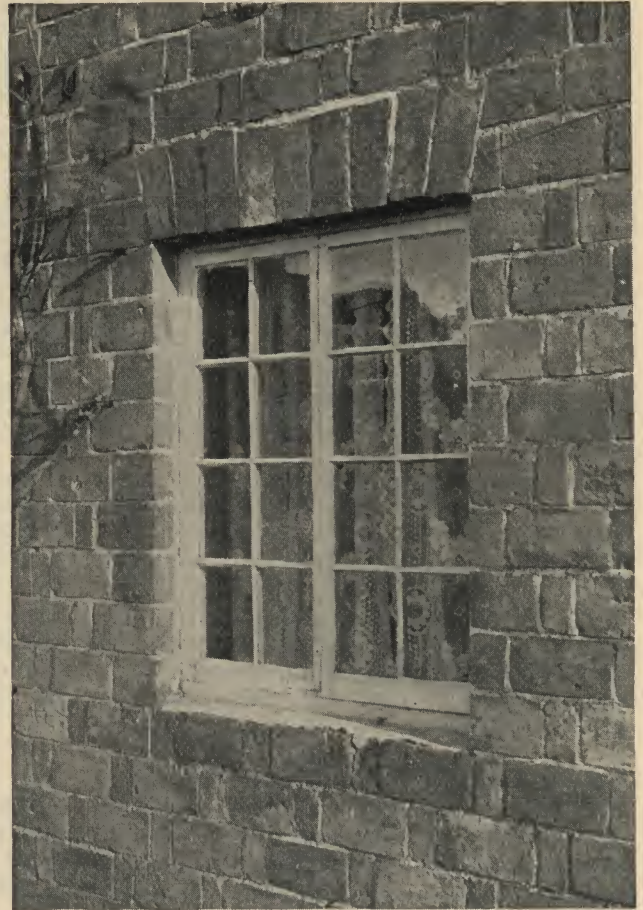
Detail of a charming cottage near Bridgewater, England; date of construction about 1803. All-rolok wall in Flemish bond.
